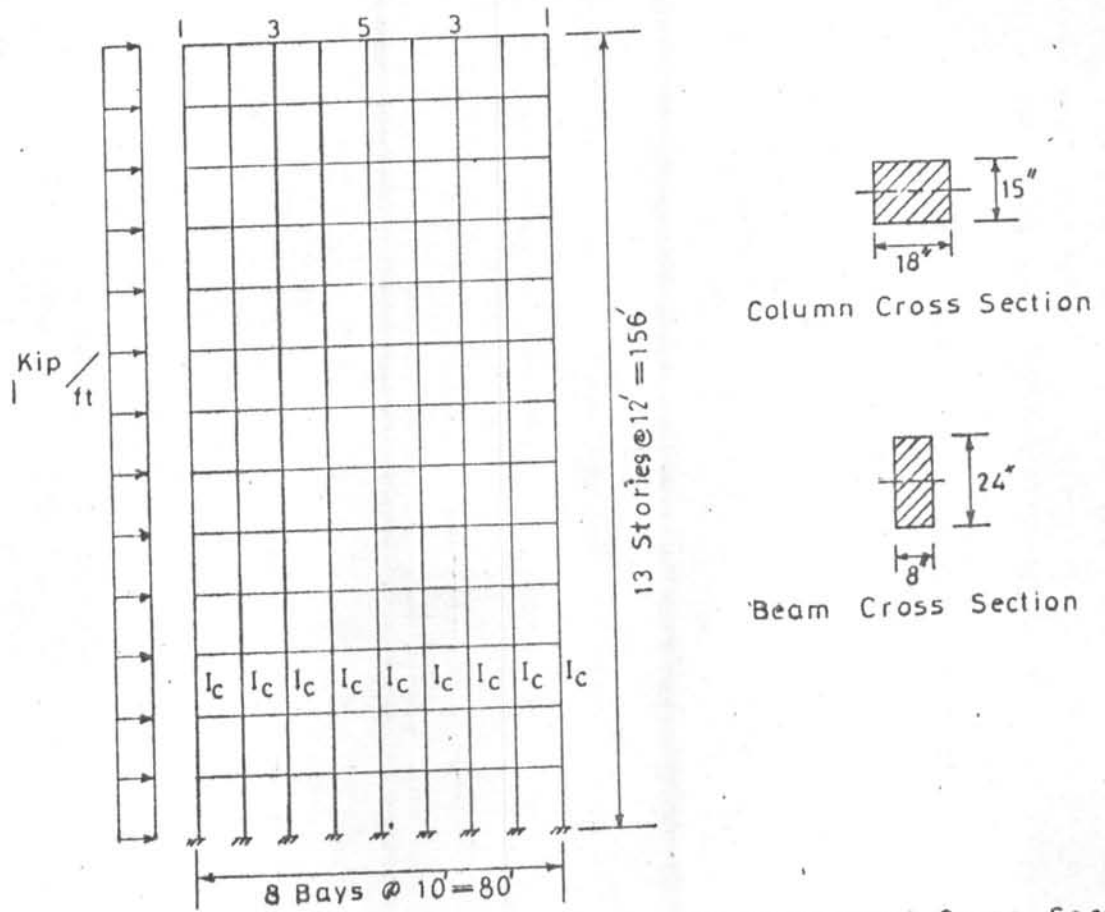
Multistory Multibay Plane Frame; Dimensions and Cross Sections
